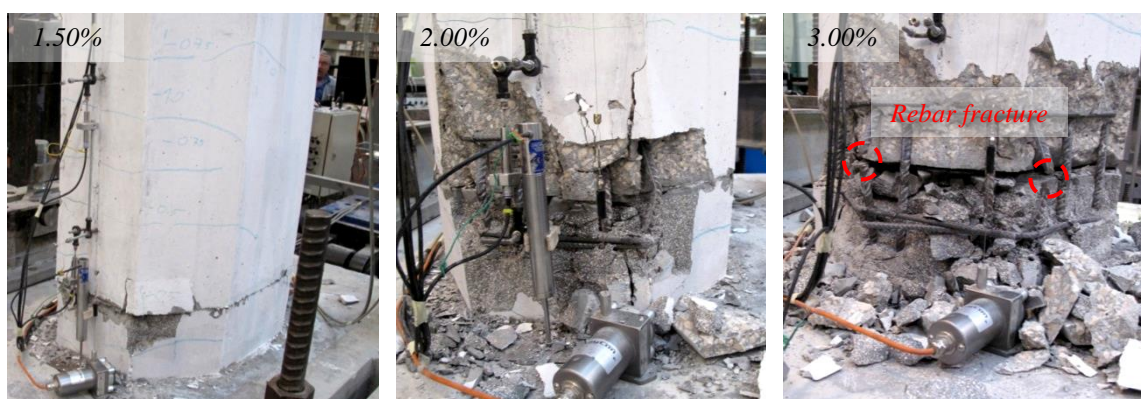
SP_F03: North side spalling, buckling and fracture
